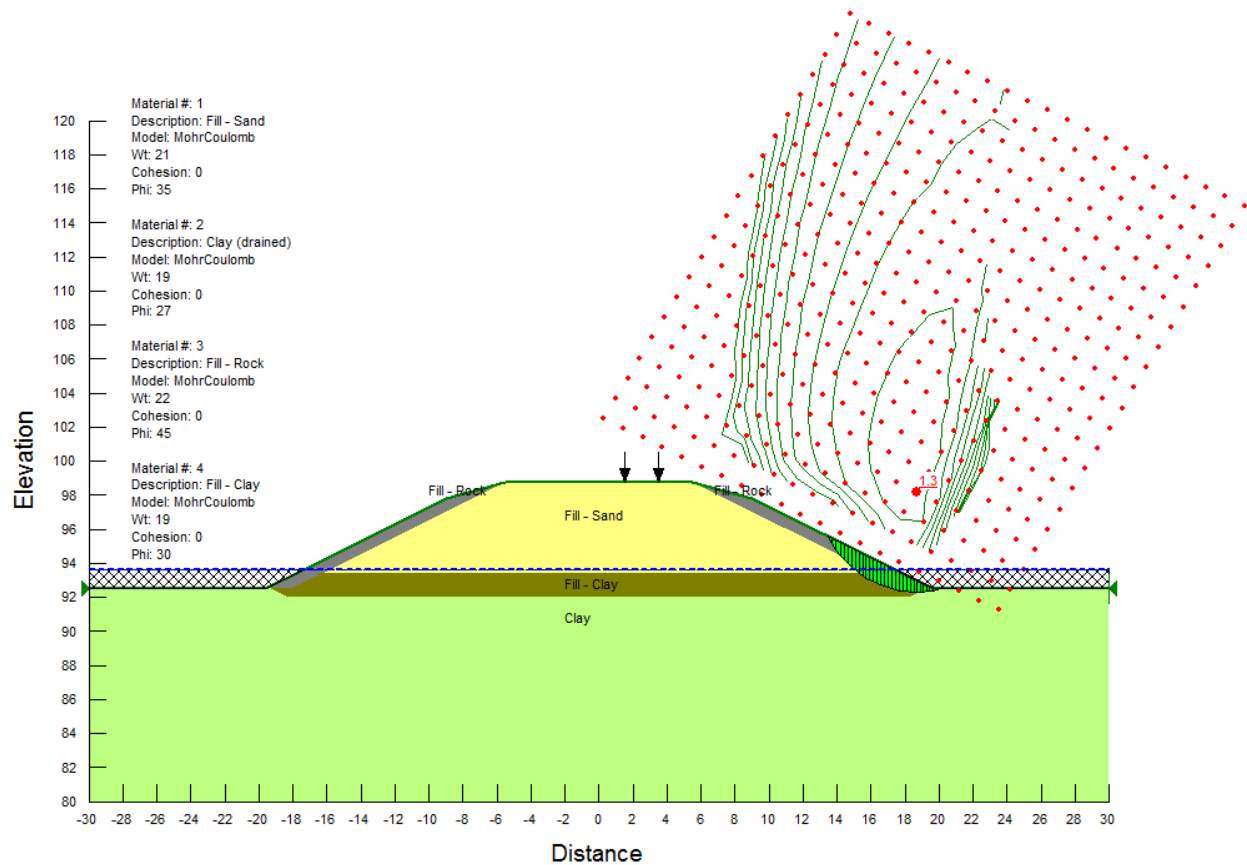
Slope stability analysis reinstated northbound lane embankment after culvert replacement, 2.0H:1V rock fill foreslopes under drained condition
